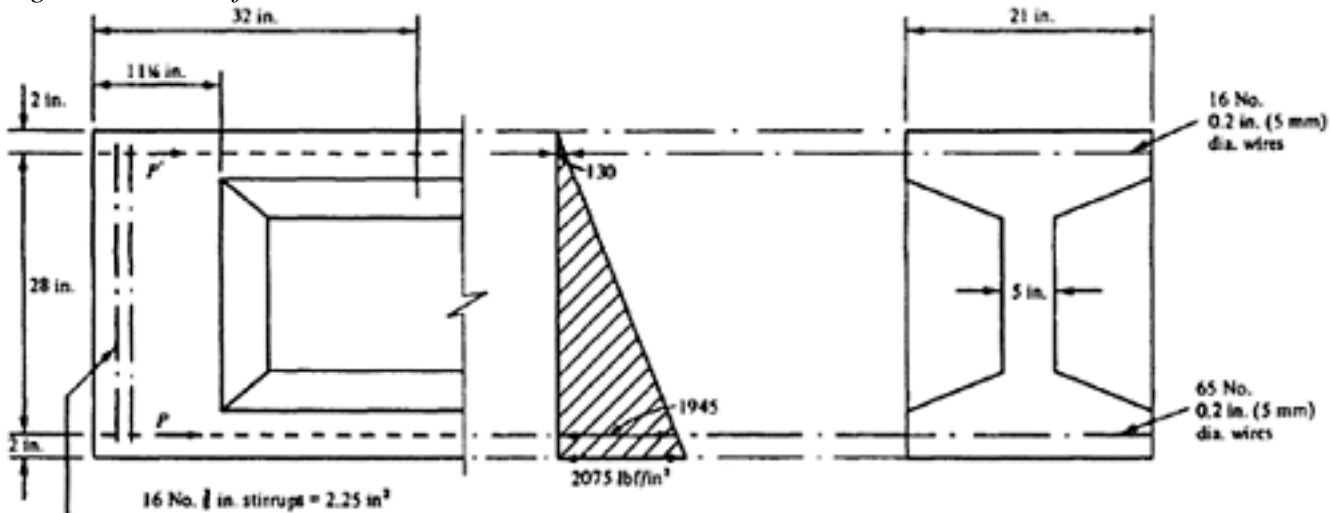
Reinforcement at end face of pretensioned roof beams
